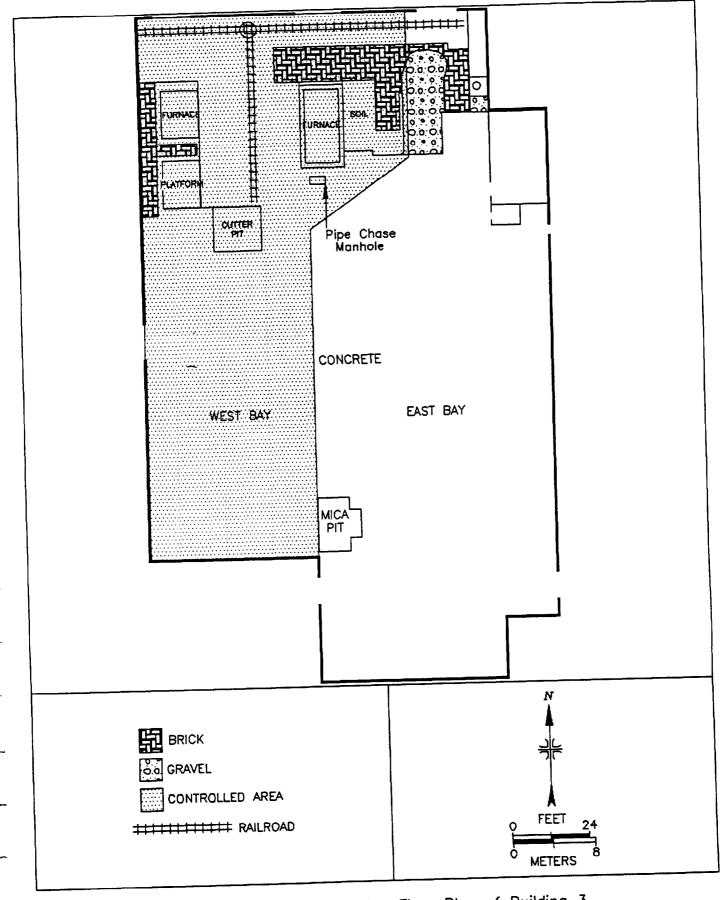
Pre-Remedial Action Floor Plan of Building 3
